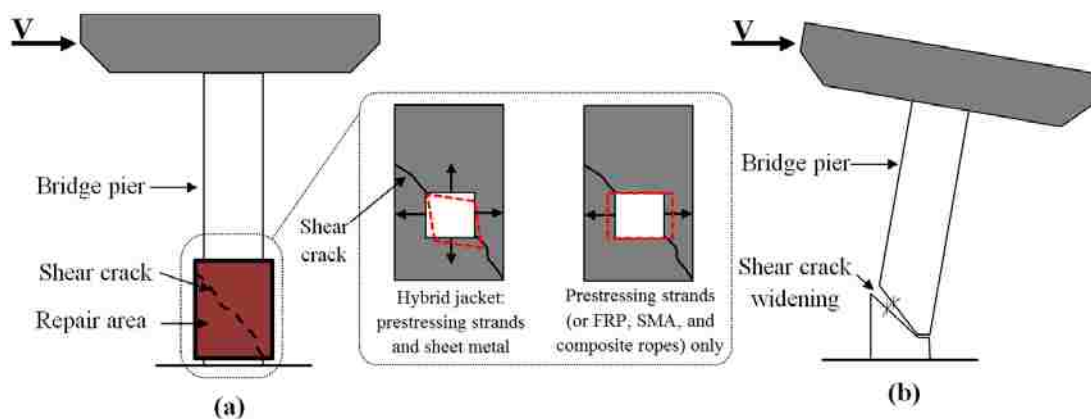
(a) Stress states in the repair jacket along the shear crack due to hybrid jacket and prestressing strands only; (b) widening of the shear crack during aftershock on unrepaired columns.
